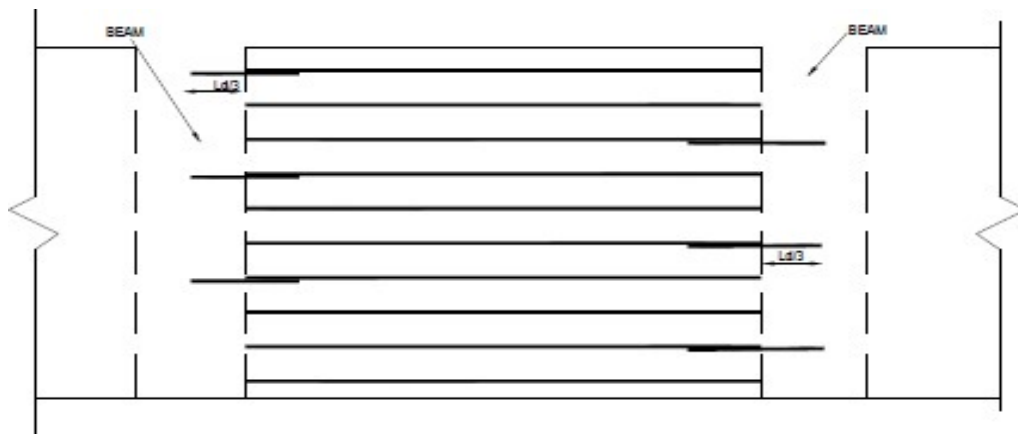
Arrangement of new reinforcement (bottom) for slab
